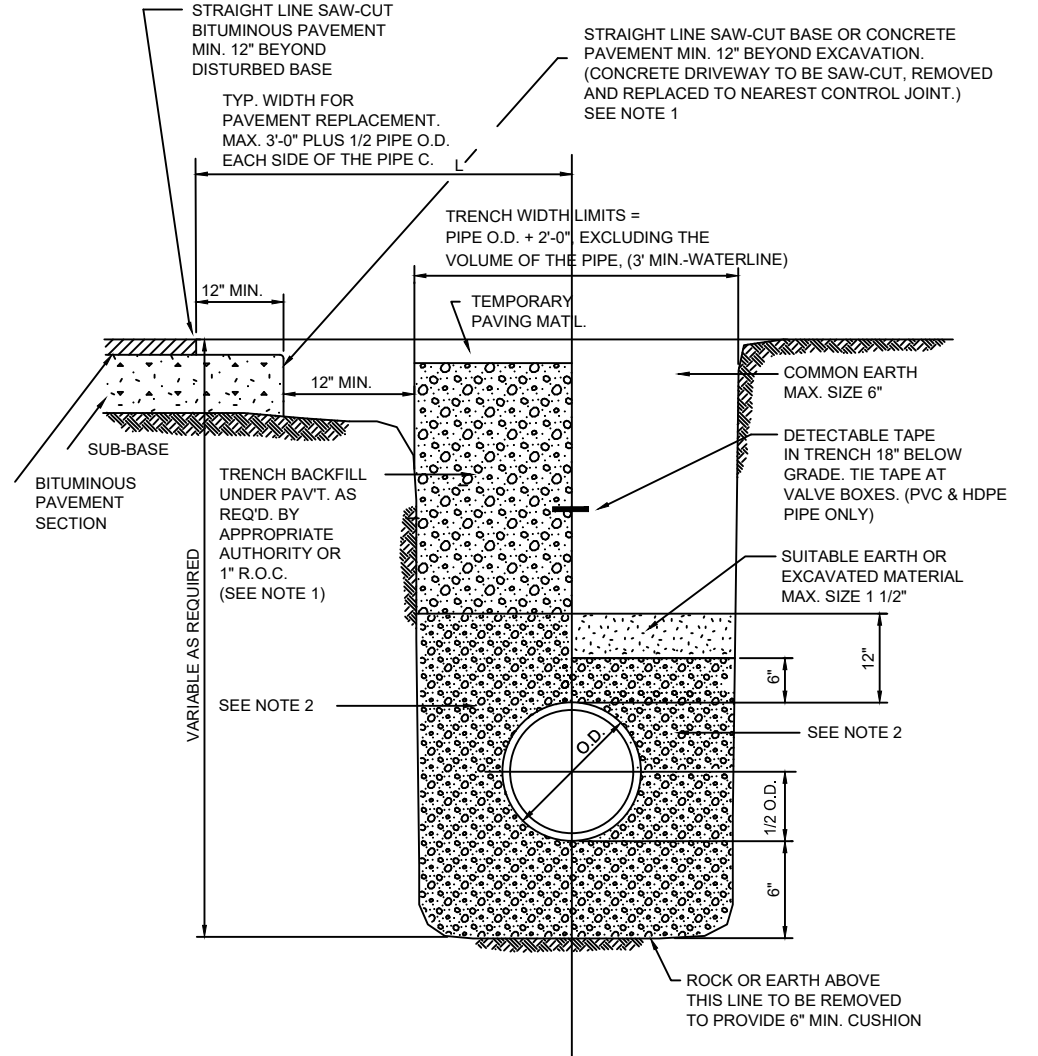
DETAILS - SITE, PAVING AND EROSION & SEDIMENT CONTROL
